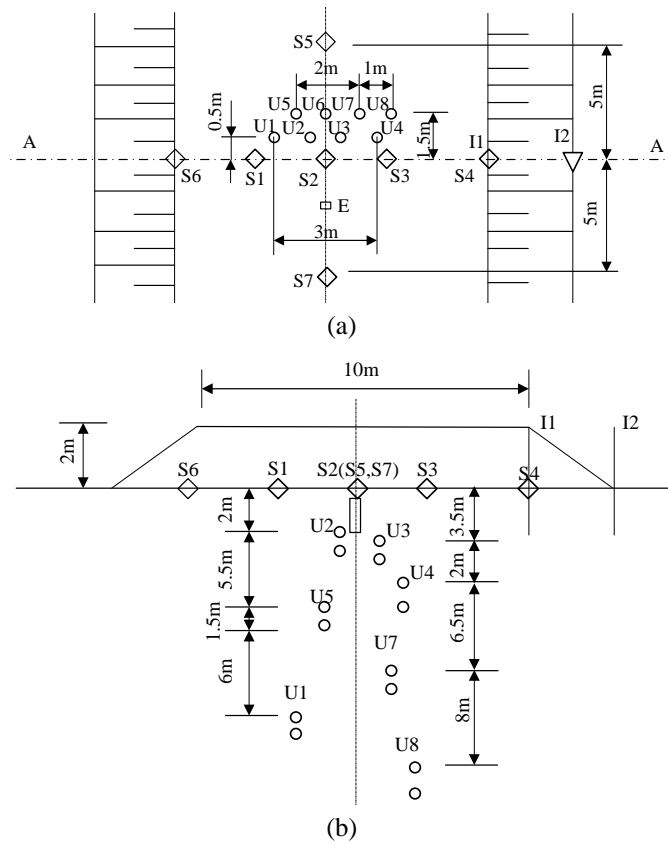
Murro test embankment with details of instrumentation: (a) plan view; (b) profile view along A-A cross section
